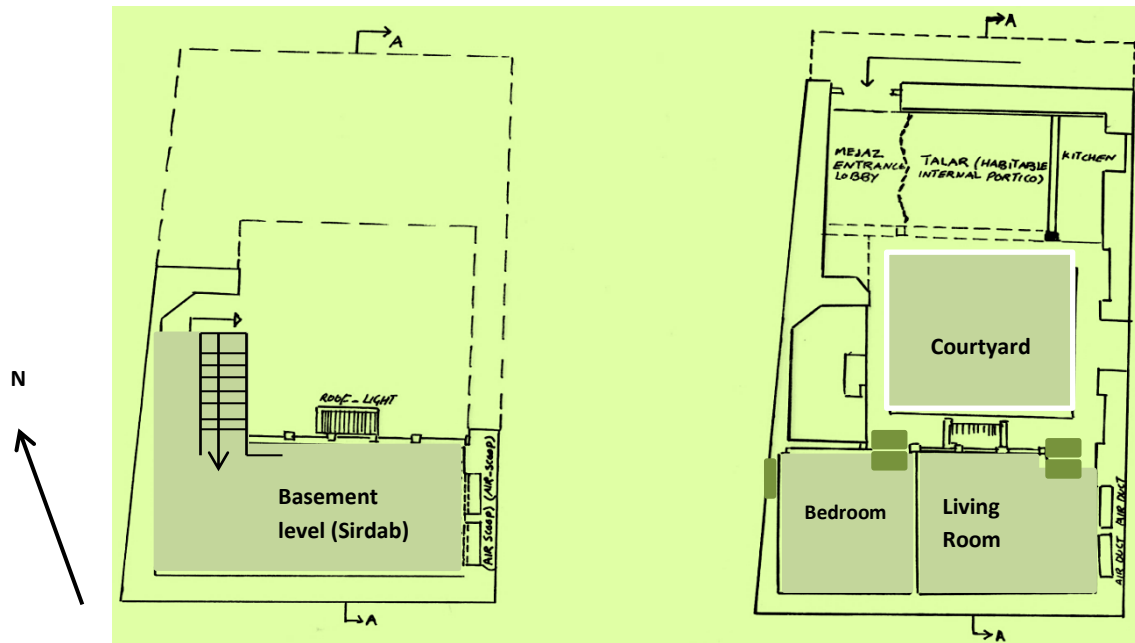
Basement level (Sirdab) plan and ground floor level plan of traditional courtyard house No. 1. Scale: 1:50
